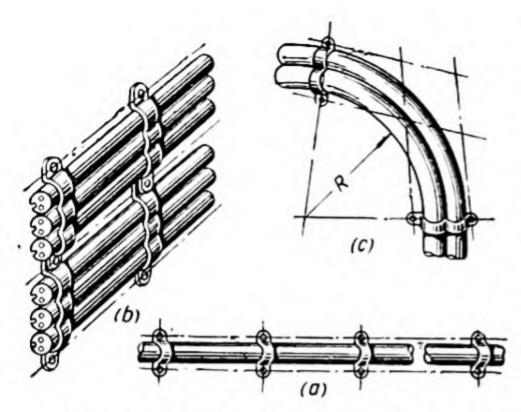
Layout of runs for wiring with grade TΠΡΦ (TPRF) wire:
